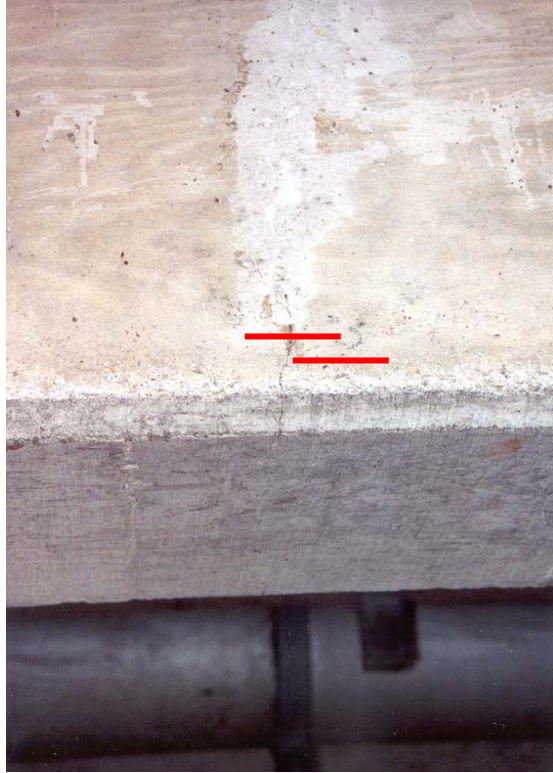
A5.4: Crack extension through the bottom of girder
